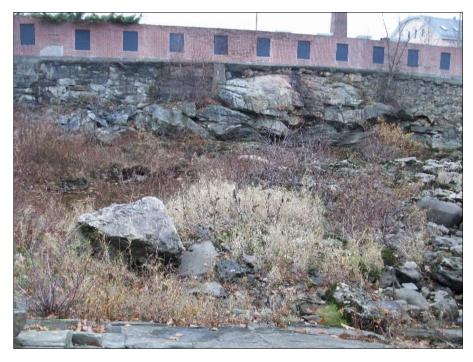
Facing east towards the retaining wall of the Seadog Brewing Company parking lot, standing on top of a small concrete dam with water overflow.
